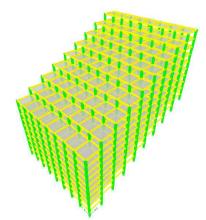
A 3-D View of 9<sup>th</sup> storeys rectangular shaped set-step back building.
